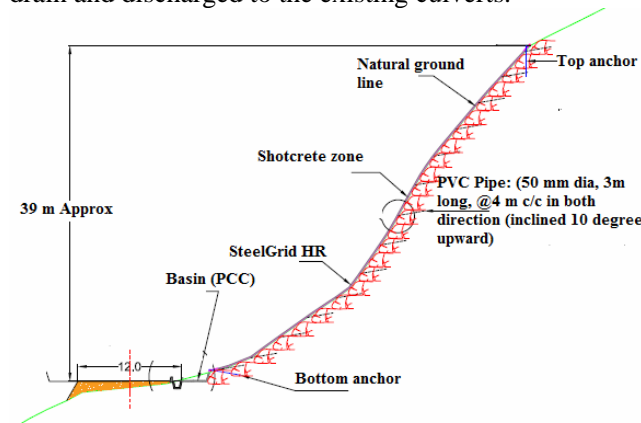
Typical Cross-Section at CH 464+475 with drainage measures
